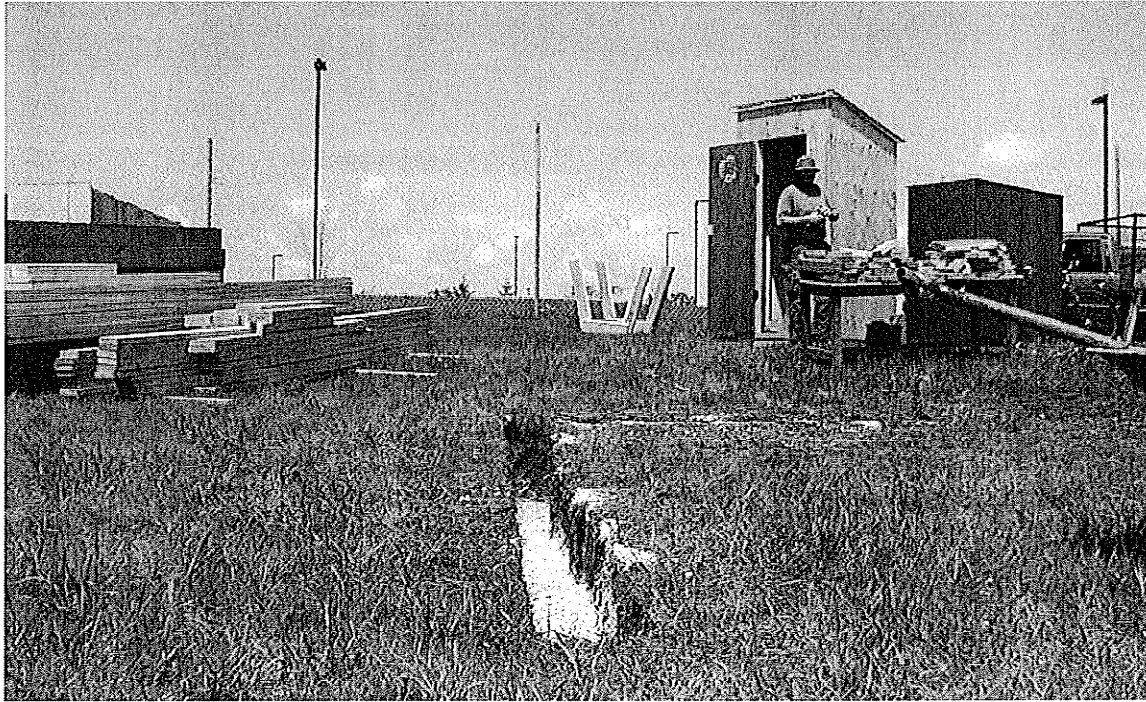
Trench, Stacked Wall Panels, Lumber Pile and Storage/Data Shed (view to the North).
